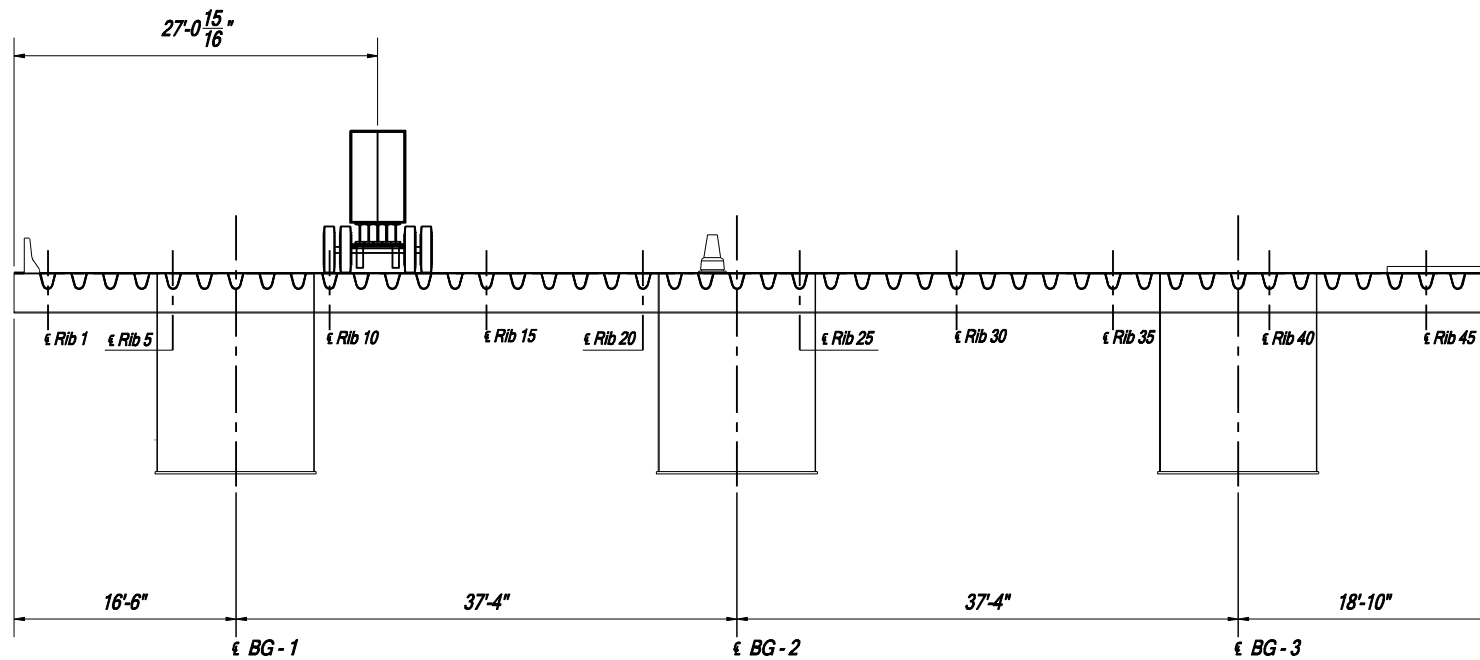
Transverse load position T28 considered for FEA of bridge deck
